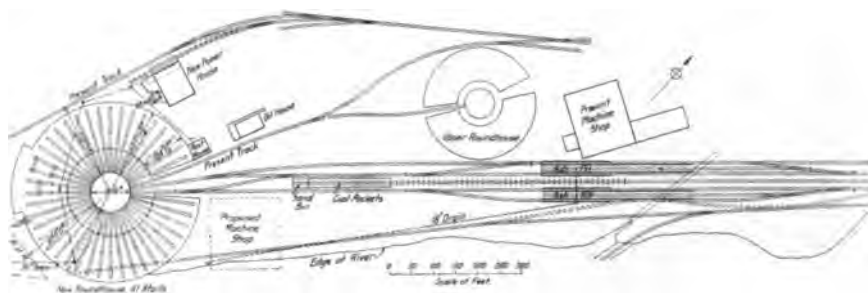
General plan, Carbondale, Pa., engine terminals—Delaware & Hudson.
